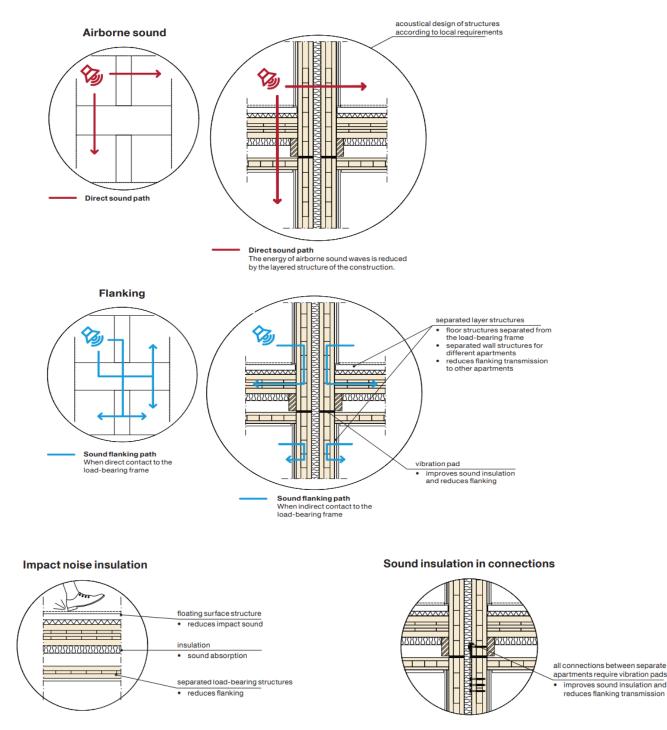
Sound insulation example for a modular timber construction (source: storaenso.com, 2016)
